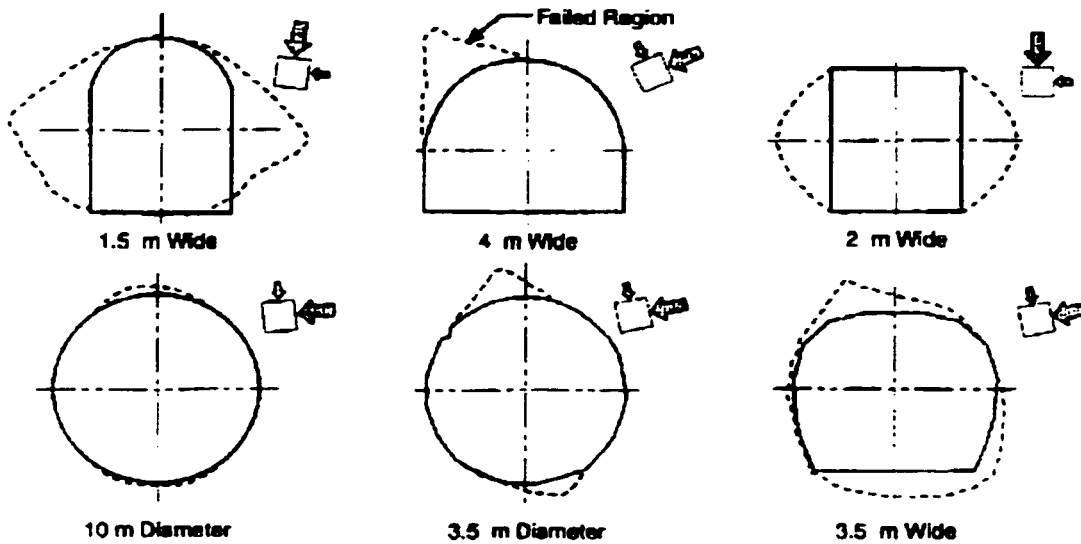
Excavation shapes and typical failures used in Figure 5.36.
